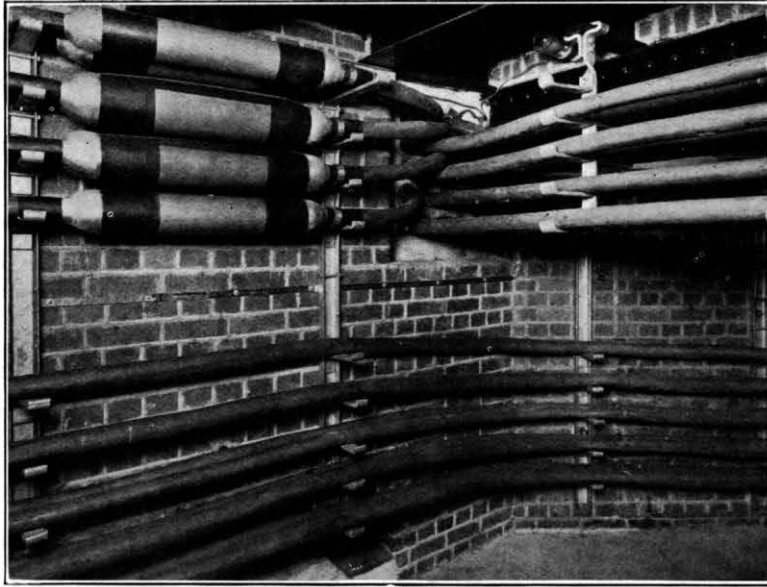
EAST AND SOUTH WALLS, LONDON WALL MANHOLE.
